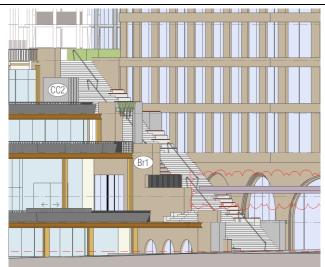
Stairs proposed from Mills Boulevard to the podium terrace
